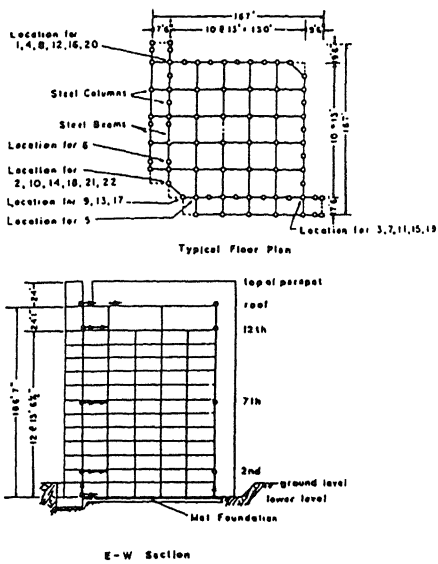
Santa Clara County Government Center - San Jose Plan and Section - Source: Shakal (1985)
